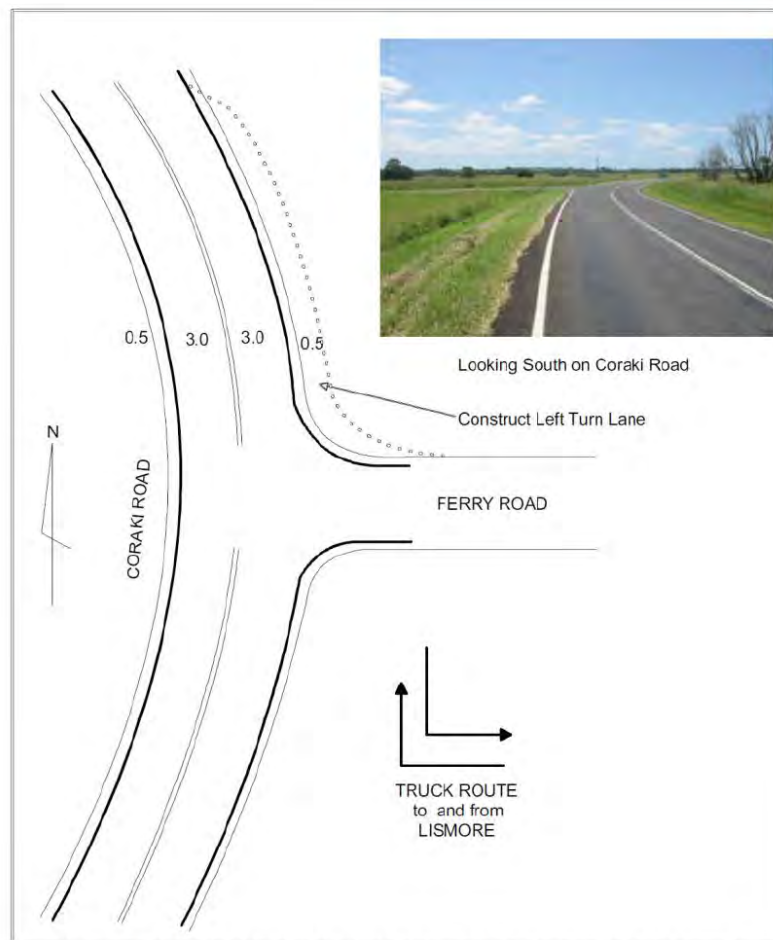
Coraki Road / Wyrallah Ferry Road Intersection Upgrade
